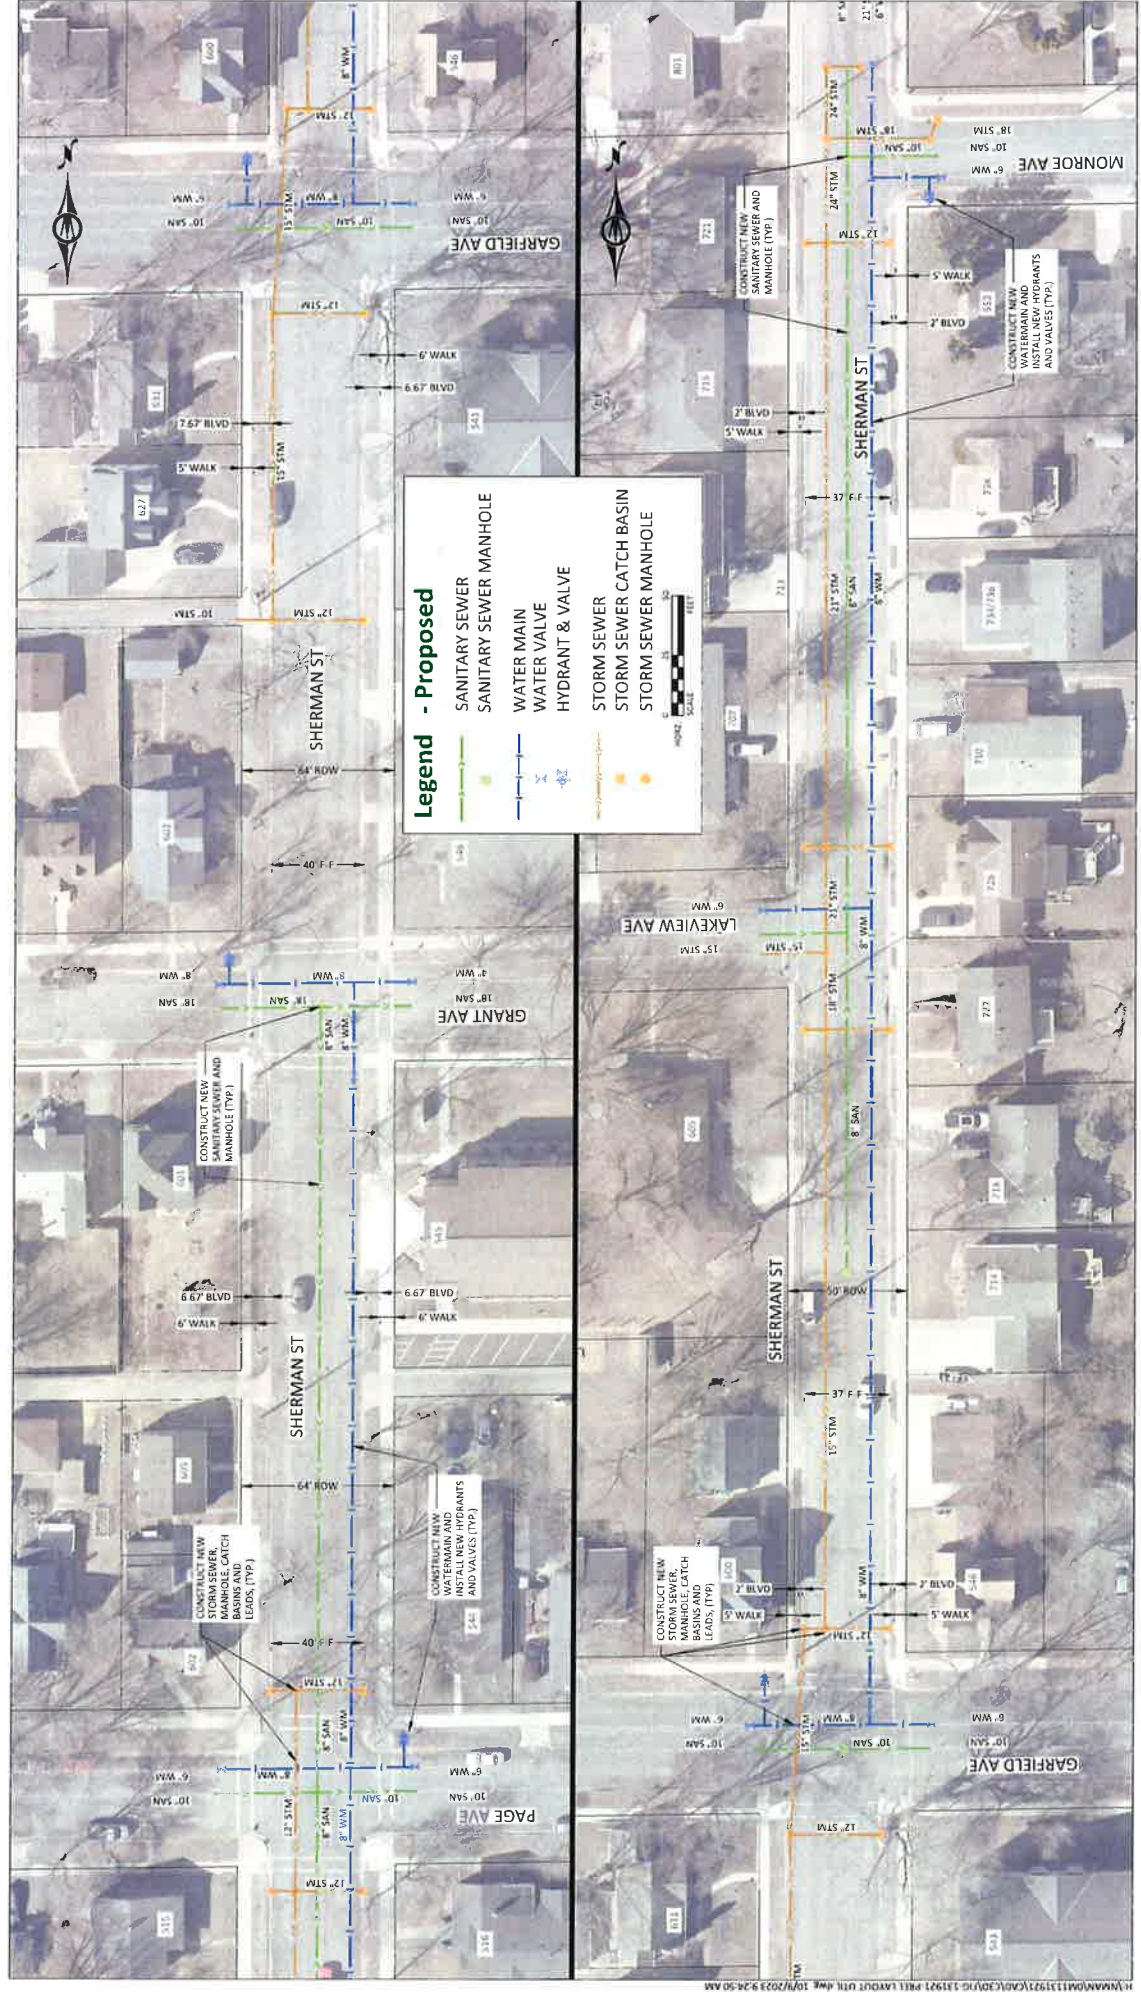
PROPOSED STREET AND SURFACE IMPROVEMENTS
